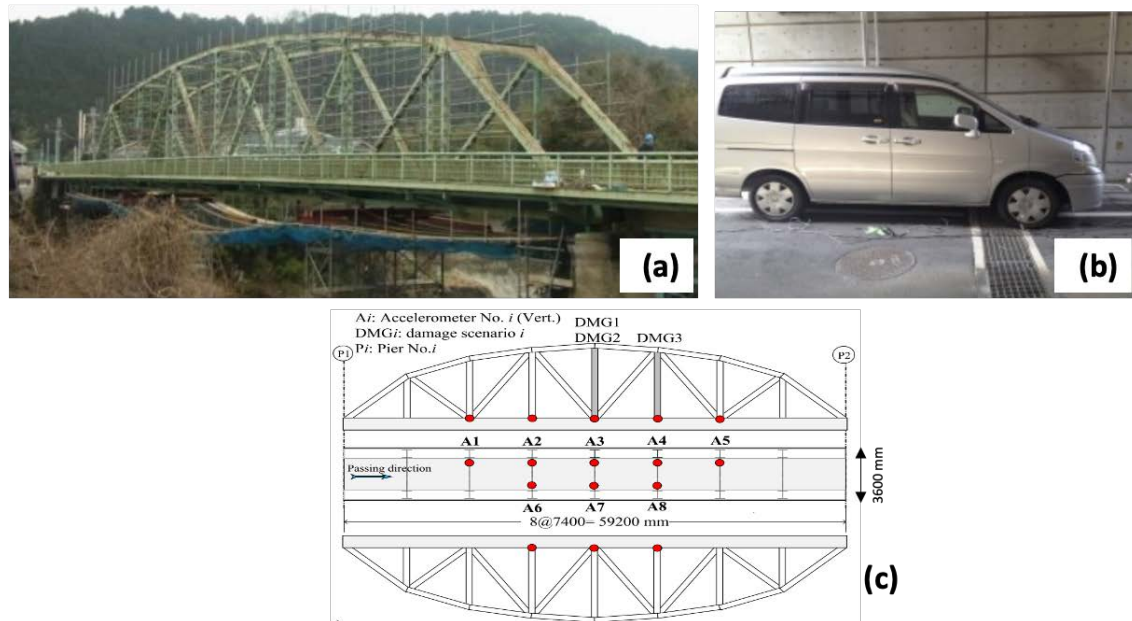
Warren truss bridge (a) longitudinal section (b) recreation vehicle (c) location of the 8 accelerometers and artificial damages.
